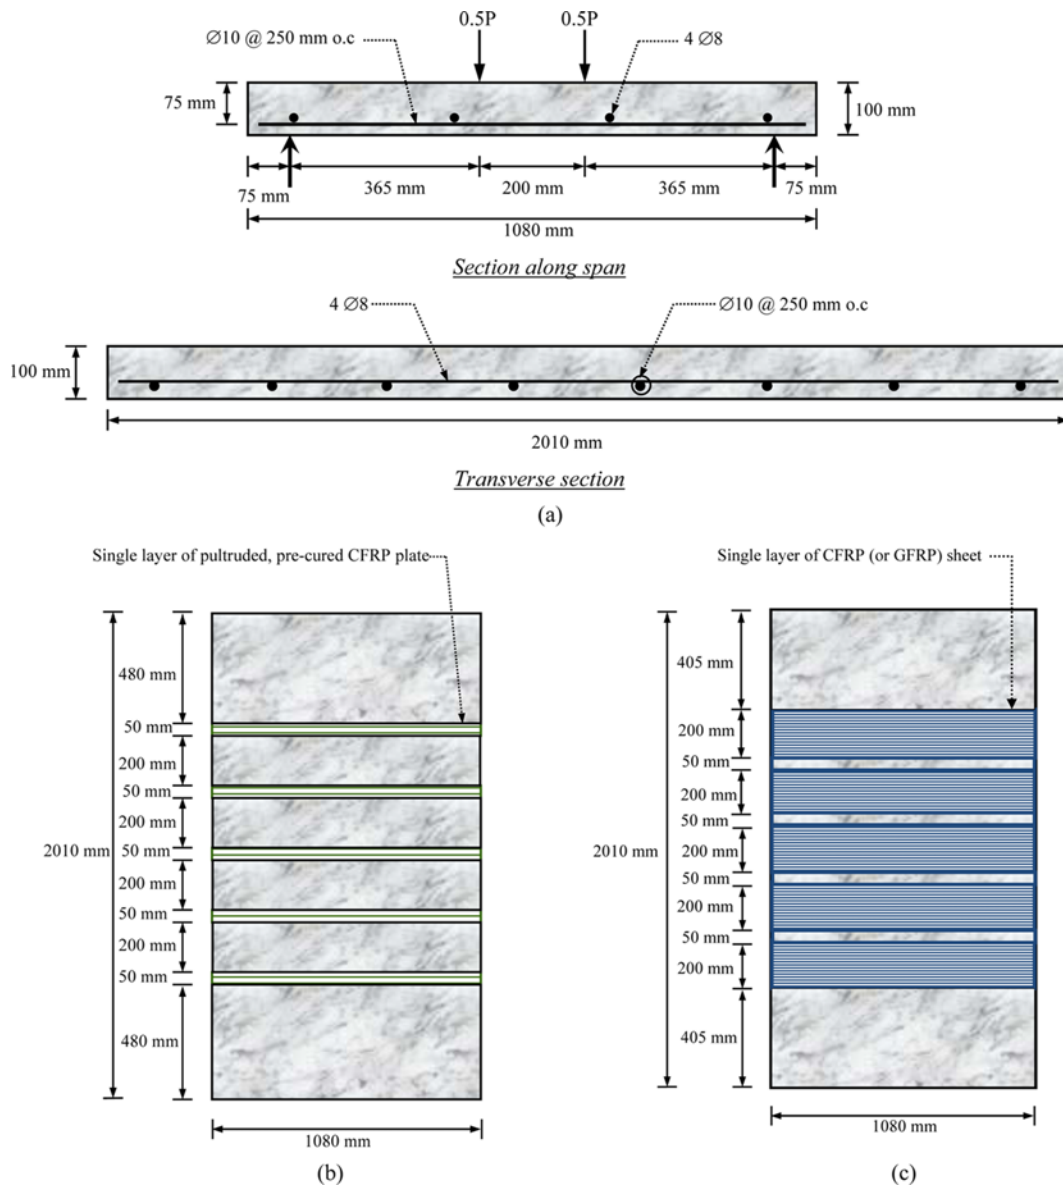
Details of Test Slabs: (a) Control Specimen SC, (b) Strengthened Specimen SCP – Bottom View, (c) Strengthened Specimens SCS & SGS – Bottom View
